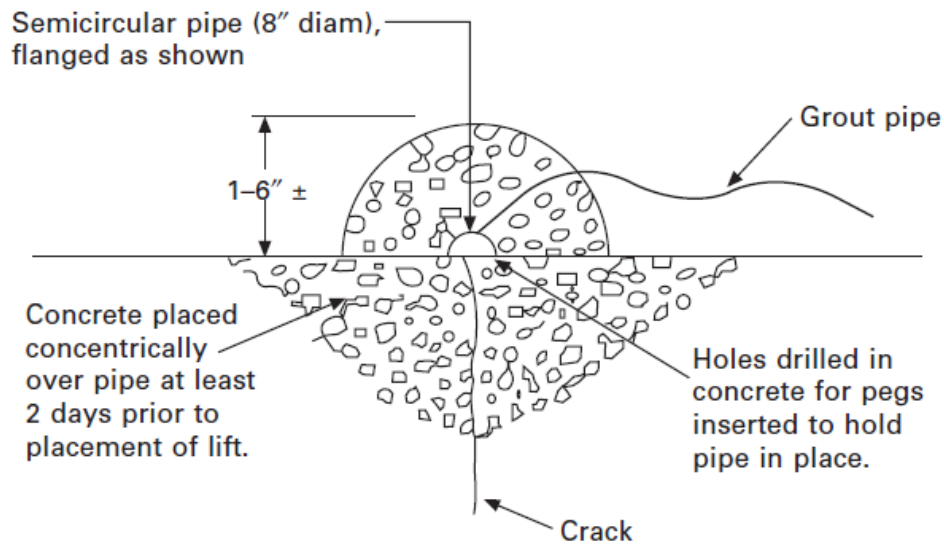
Crack arrest method (ACI Committee 224.1R).
